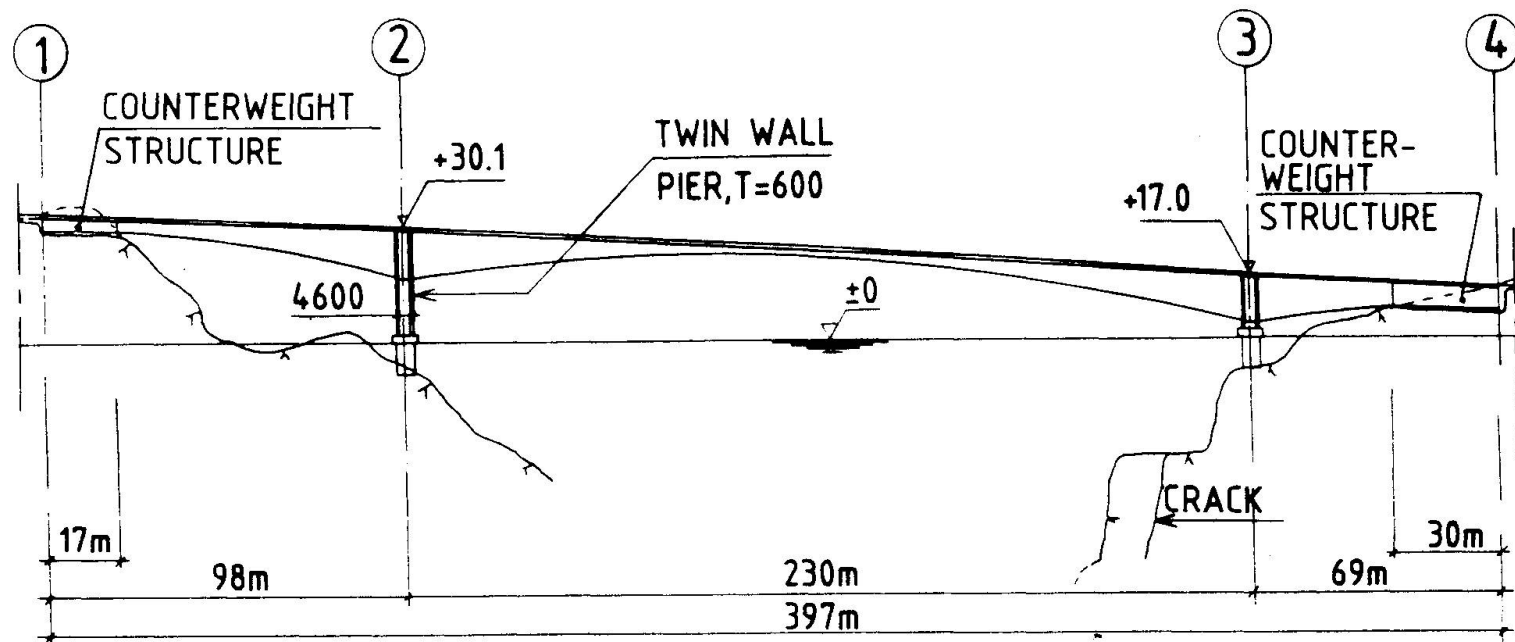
NORDDALSFJORD BRIDGE. ELEVATION
